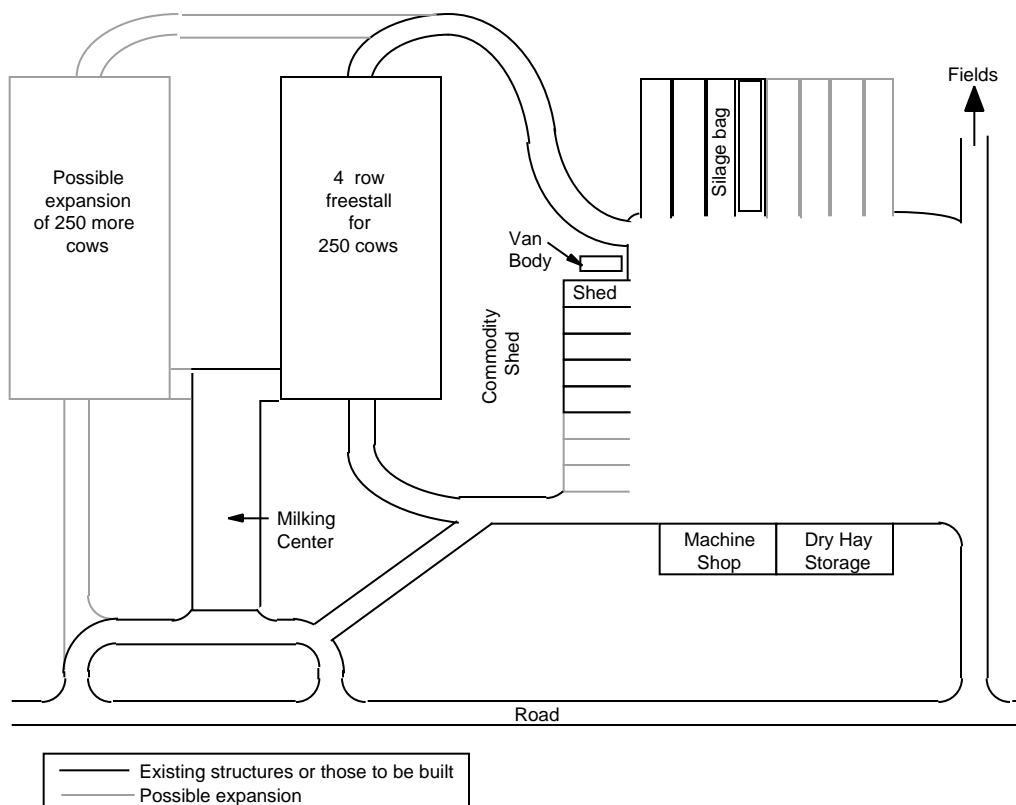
The final site plan should include existing buildings, those to be built, and possible future expansion options.
